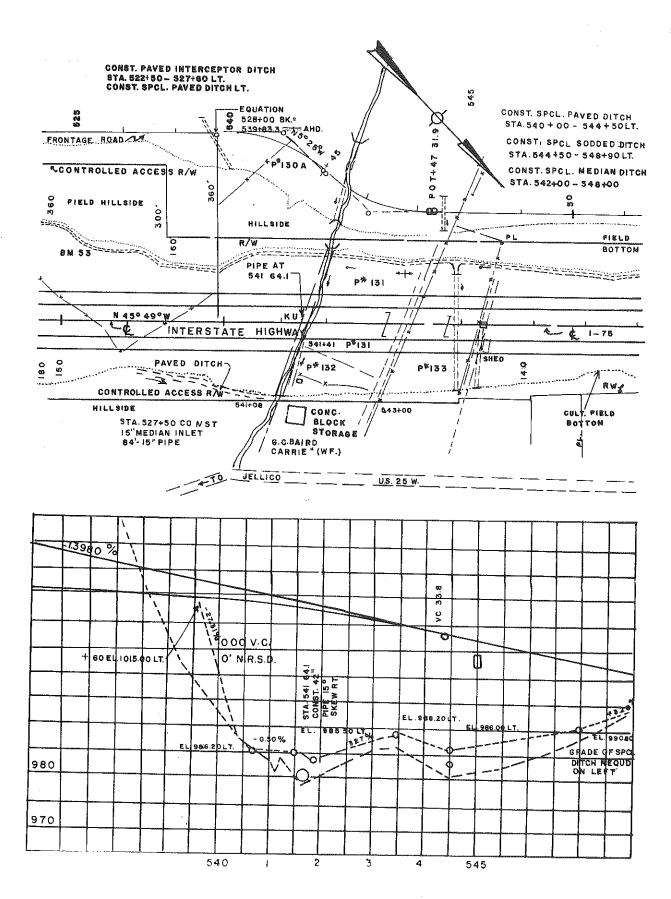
42-inch Pipe Outlet Near Baird's Upholstery Shop, <u>Department v. Baird</u>.
